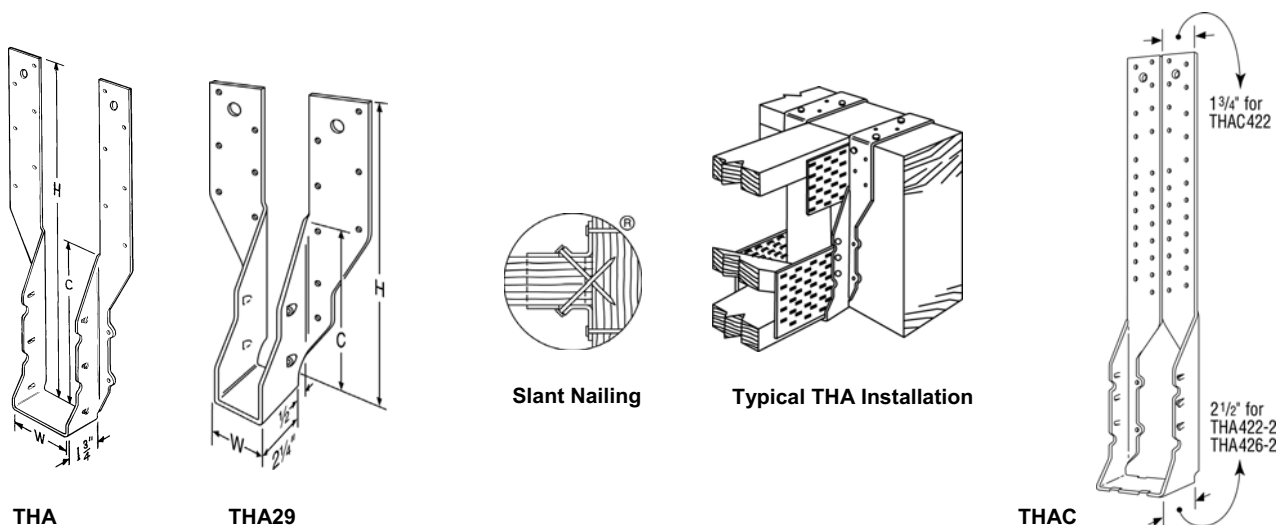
THA SERIES TRUSS HANGERS ADJUSTABLE
